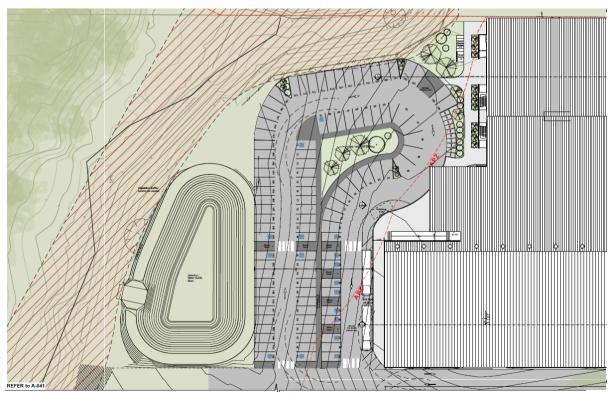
Parking Layout – Part 1 (Source: BKA Architecture)
